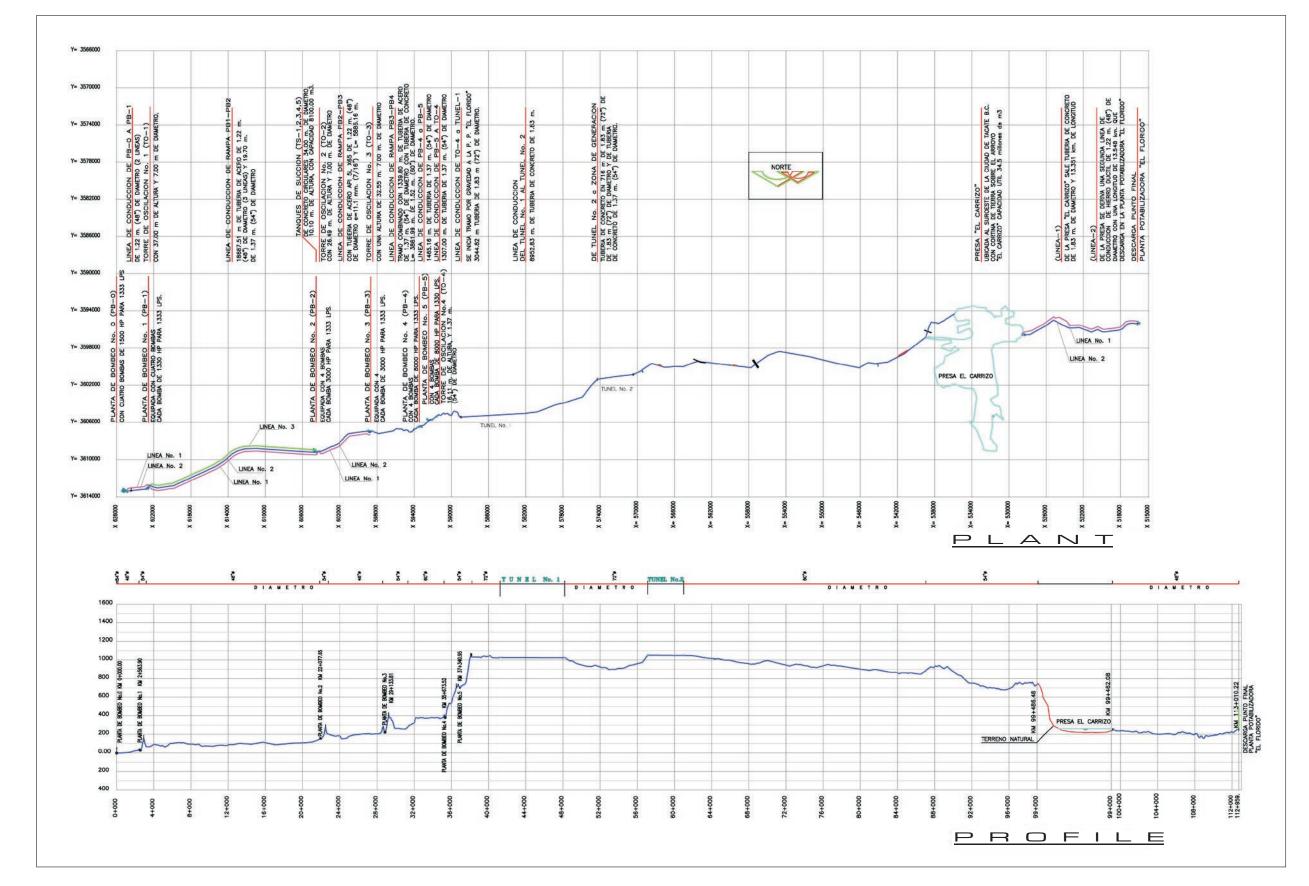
shows the outline and floor plan of the Mexicali-Tijuana Aqueduct, including the location of the most important facilities.
